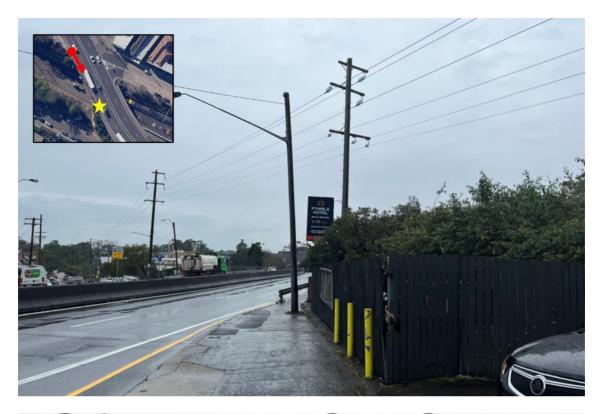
Looking north showing the retailing wall and existing vegetation (Source: Keylan)
